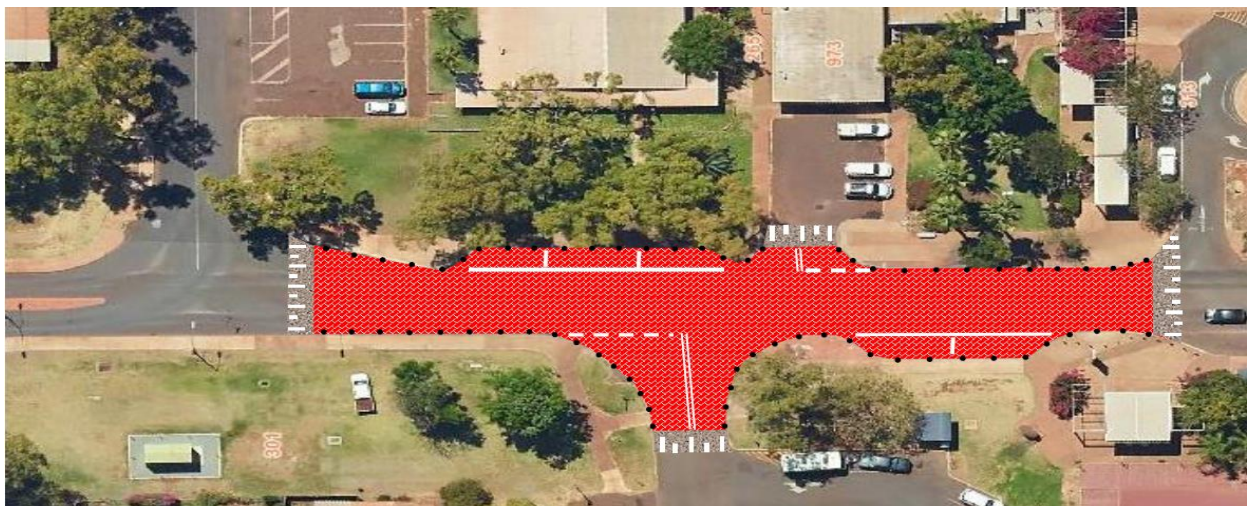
Shared Traffic Zone – Central Road, Tom Price
